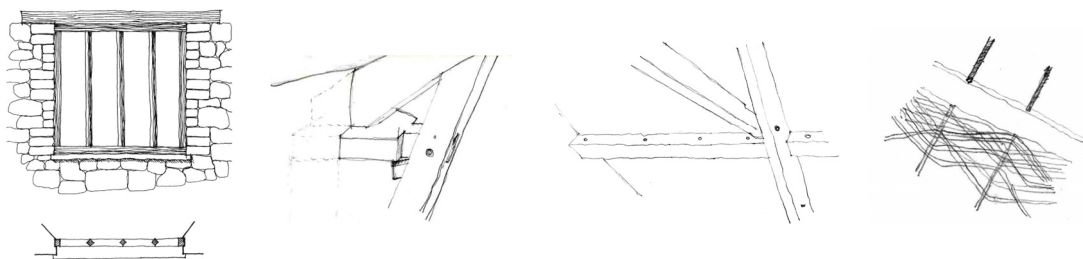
Details at Parc Lodge Farm of diamond-mullioned window in barn; Fig. 4.15 Timber roof construction dated from 1550 to 1610; Fig. 4.16 Holes in the purlins in the roof which may have been for the framework of a woven wicker lattice ceiling; Fig. 4.17 Woven wicker ceiling as found at Hendre'r-yydd Uchaf at St Fagans.
